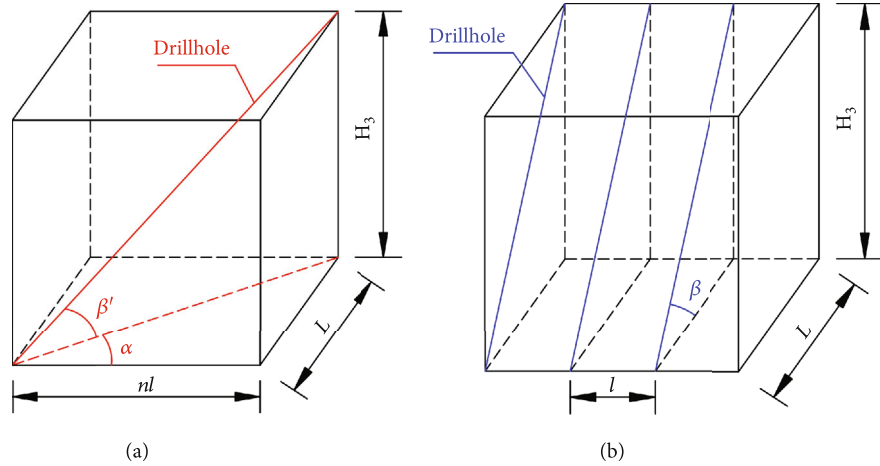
Sectional view of the drillhole of TA: (a) sectional view of A_n and (b) sectional view of B_n .
